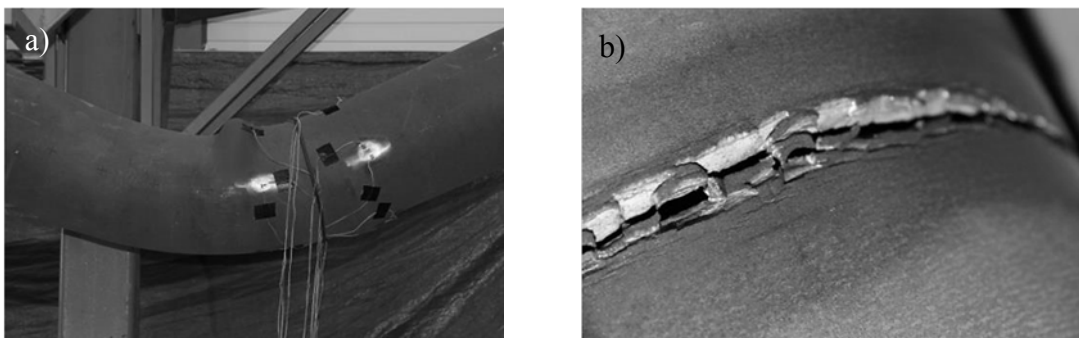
Failure aspect of SP4 specimen: a) buckle detail; b) detail of the crack at the end of the test.
